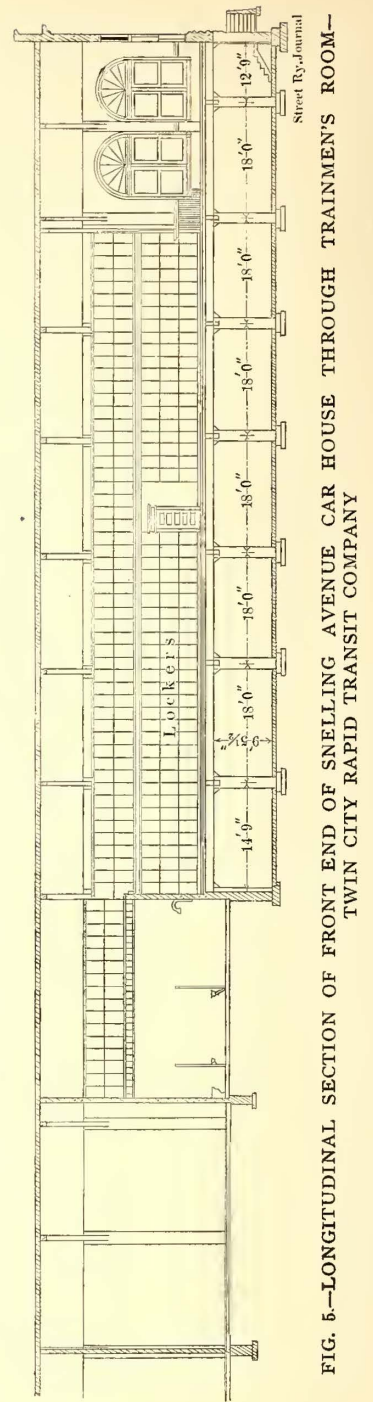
LONGITUDINAL SECTION OF FRONT END OF SNELLING AVENUE CAR HOUSE THROUGH TRAINMEN'S ROOM—TWIN CITY RAPID TRANSIT COMPANY
